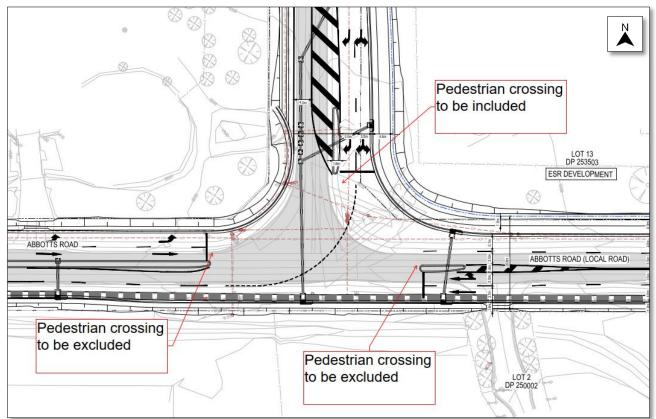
Aldington Road / Abbotts Road (Interim Layout) Source: AT&L Drawing No. 21-843-SKC173
